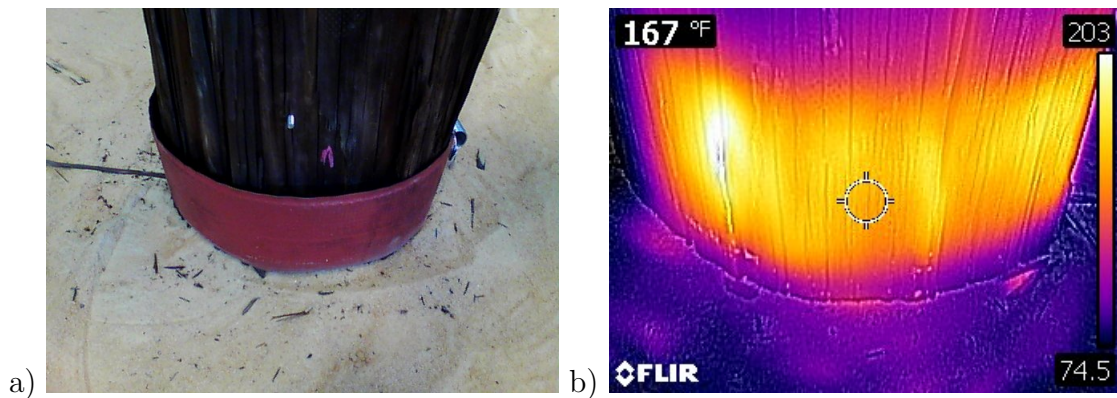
Infrared Thermography: a) photograph of location of silicone rubber band drum heater during thermal testing; b) typical thermal image acquired during testing
